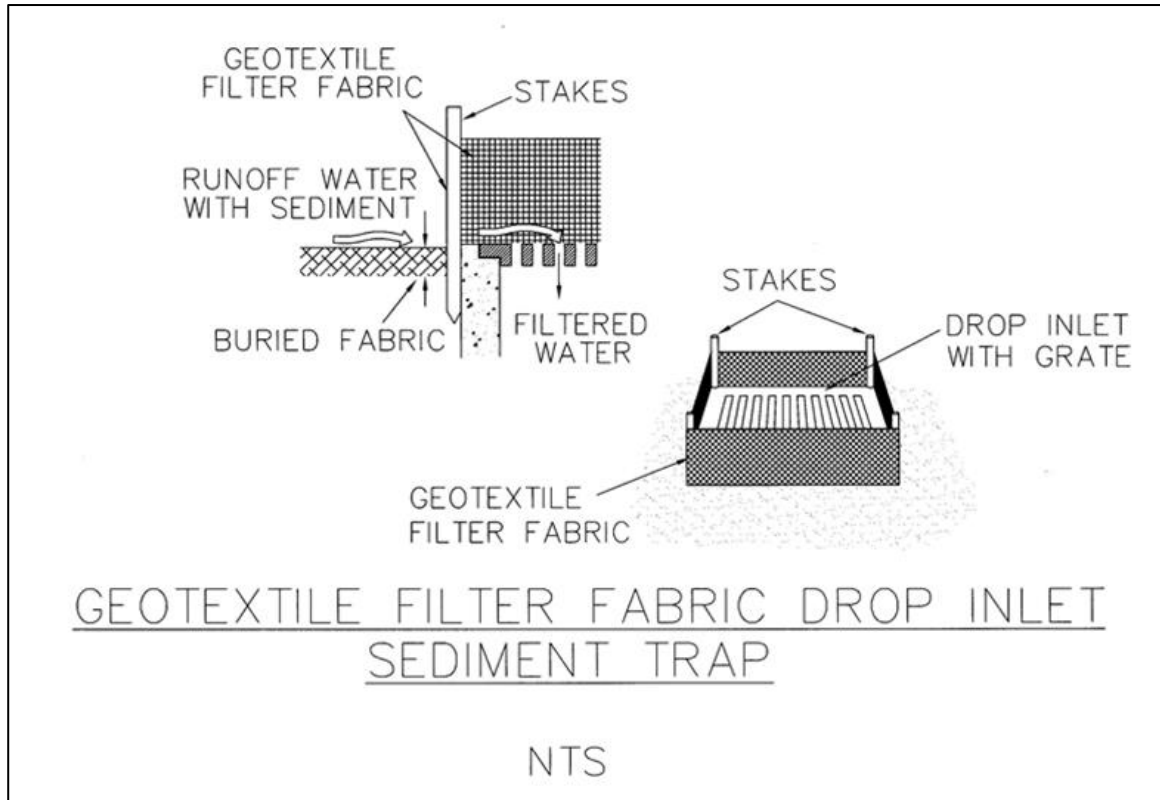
Geotextile Filter Fabric Drop Inlet Sediment Trap Detail
